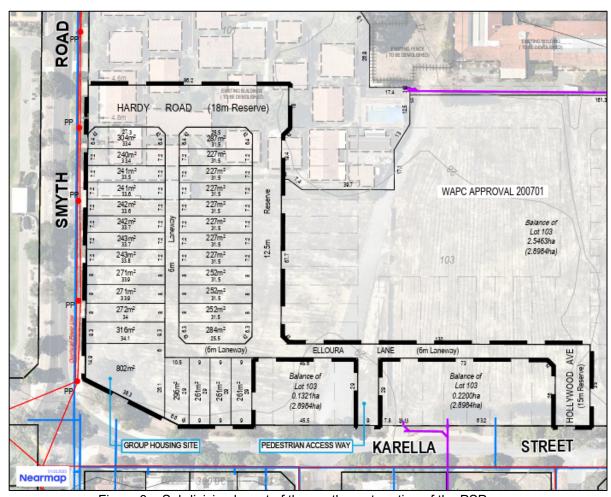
Subdivision layout of the south-west portion of the PSP area
